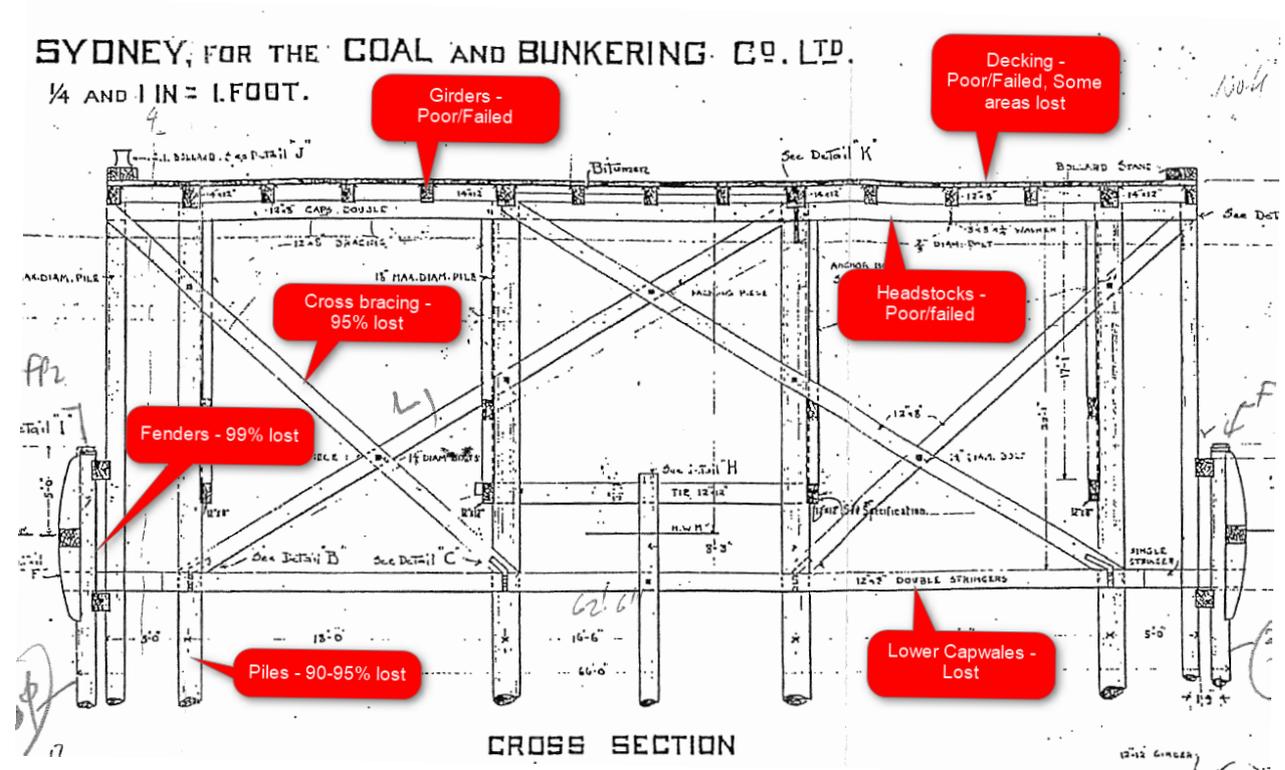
Cross section of original timber wharf structure with mark-up of condition and loss of elements, as of 2017.
